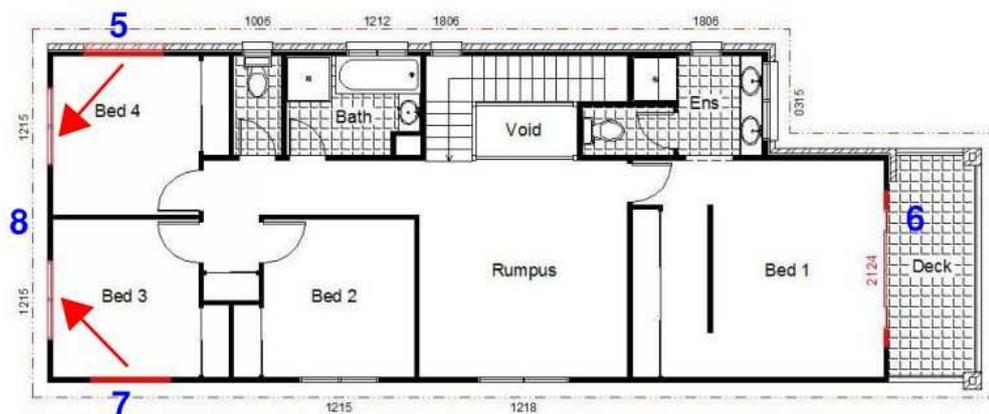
Redesigned first floor plan of Dwelling 8 in Brisbane, Perth, Sydney and Adelaide.
